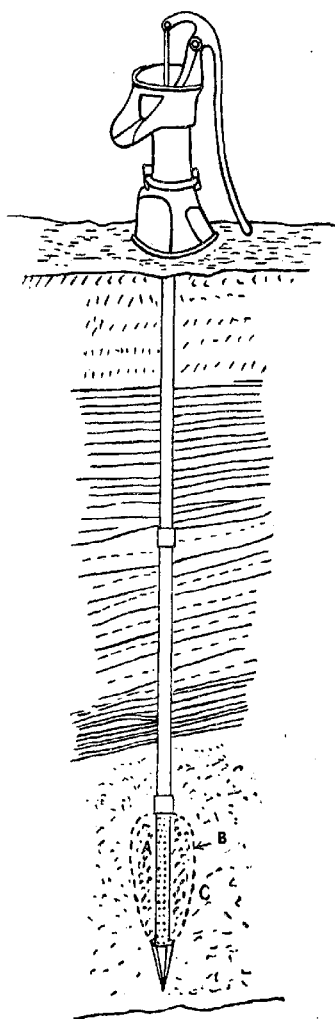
Abyssinian Tube Well A.—The so-called cavity.
